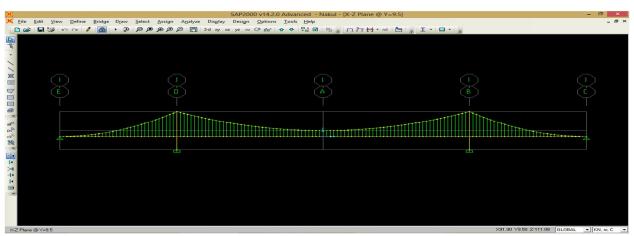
2 D View of Suspension Cable Bridge (Sap 2000)
